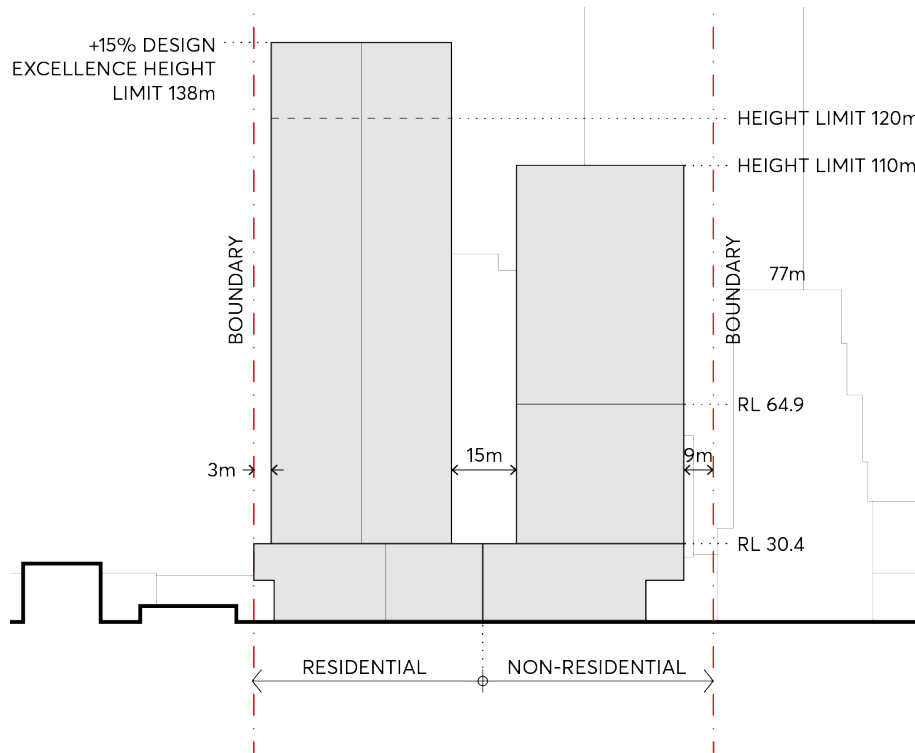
Building envelope Jubilee Park elevation
